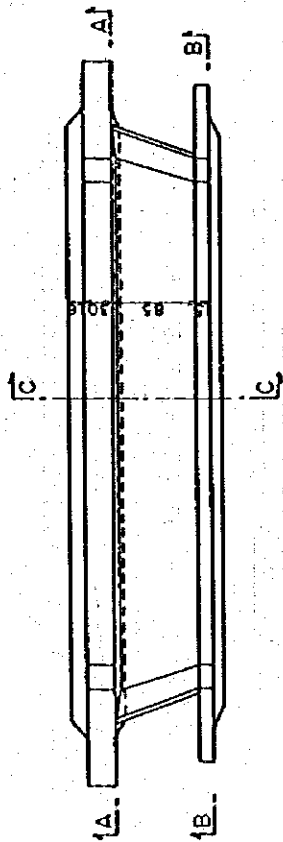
TYPICAL DESIGN OF CONSOLIDATION DAM
